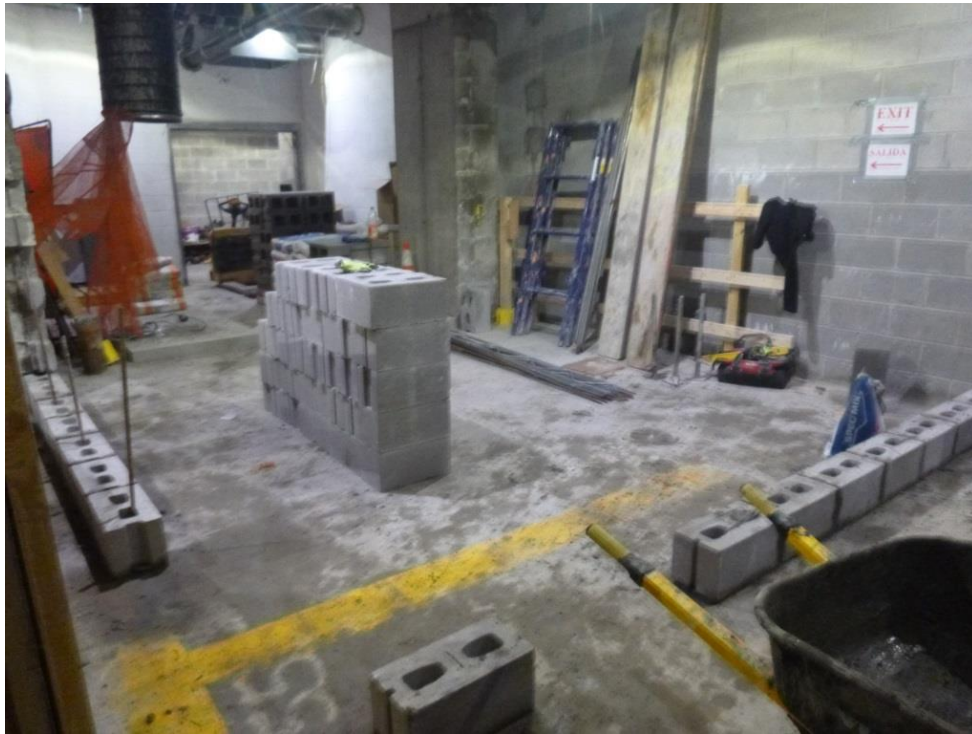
, 03/01/2017: View of concrete building slab composite cover (facing southeast).
